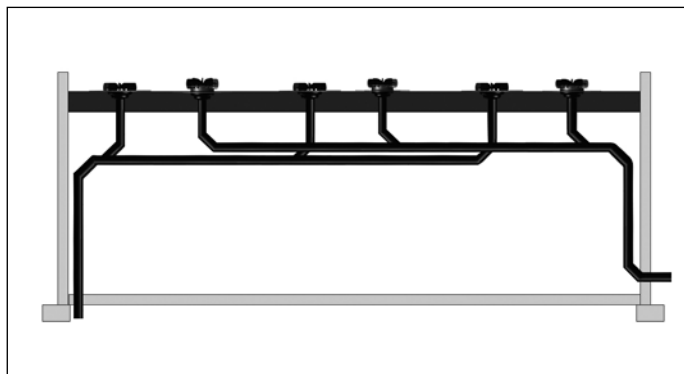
Siphonic roof drainage system with siphonic emergency overflow (not connected to sewer)
